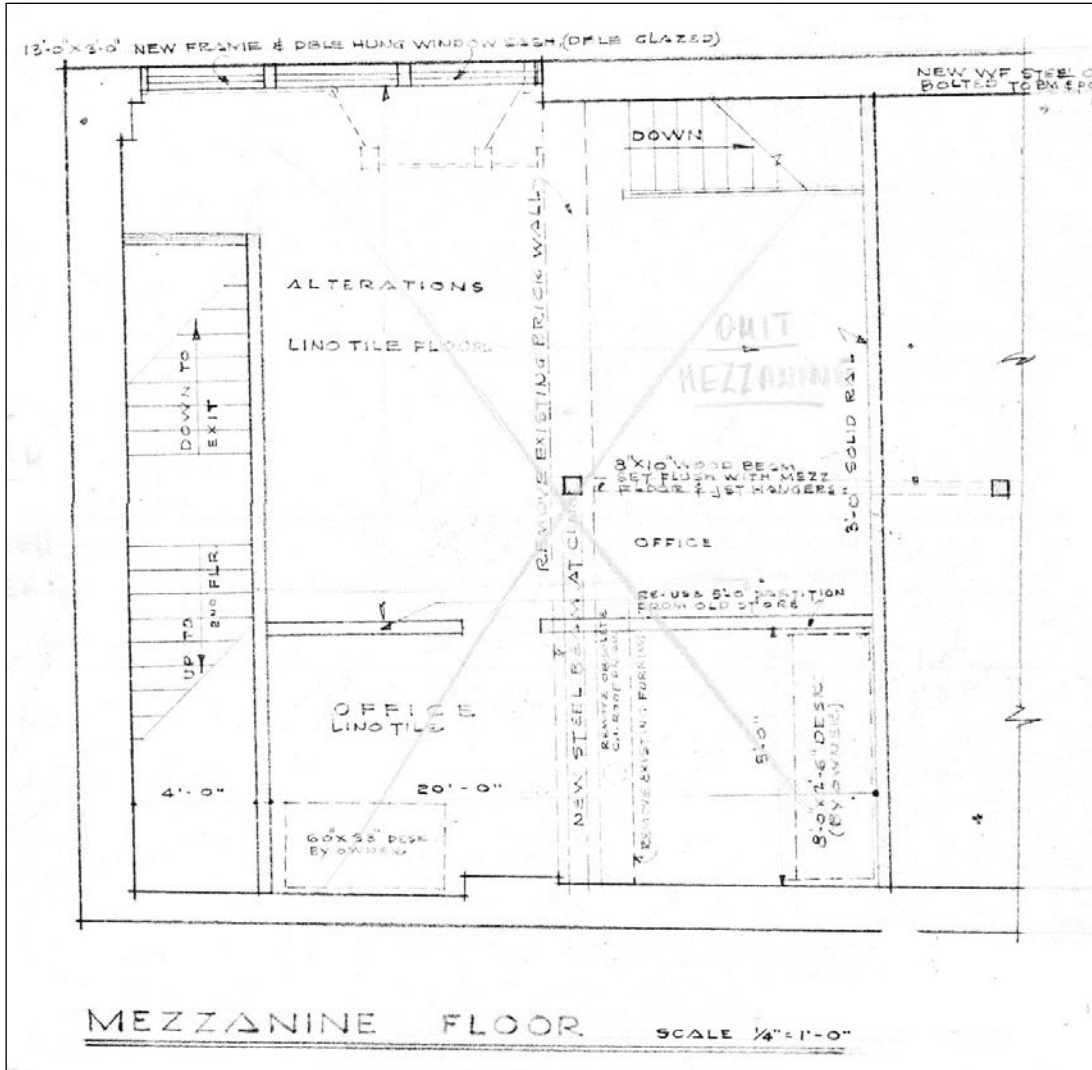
“Mezzanine Floor”, architect’s drawing, Plan #583/1956. An “X” and the words “Omit Mezzanine” have been pencilled in on the original plans. (City of Winnipeg.)
